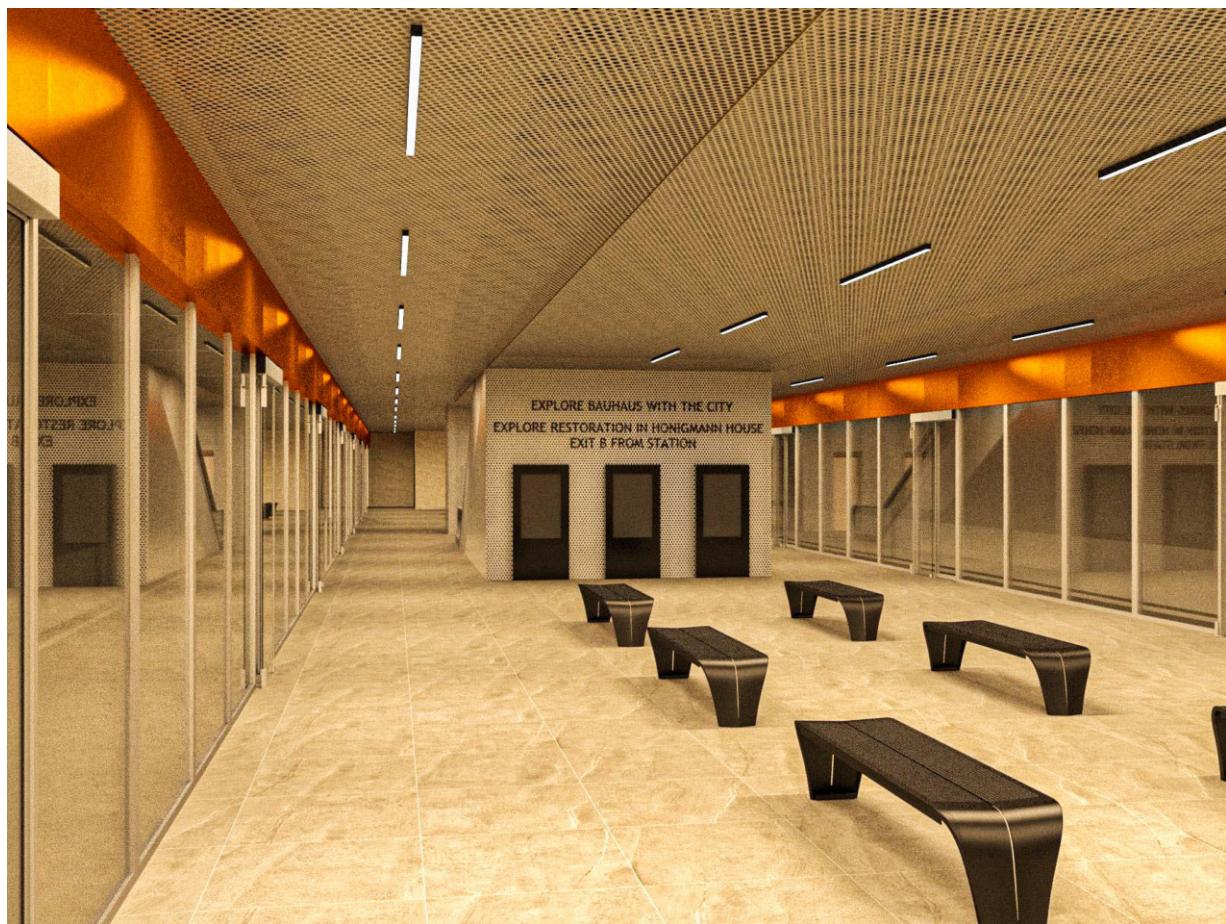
Magen David Metro Station, platforms level, view behind escalators.
